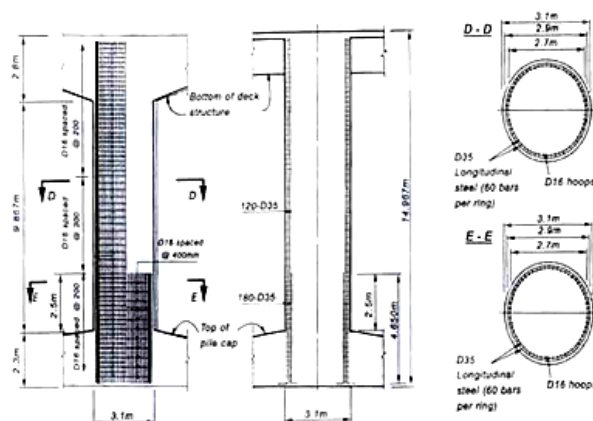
Longitudinal and transverse reinforcement of typical collapsed pier
